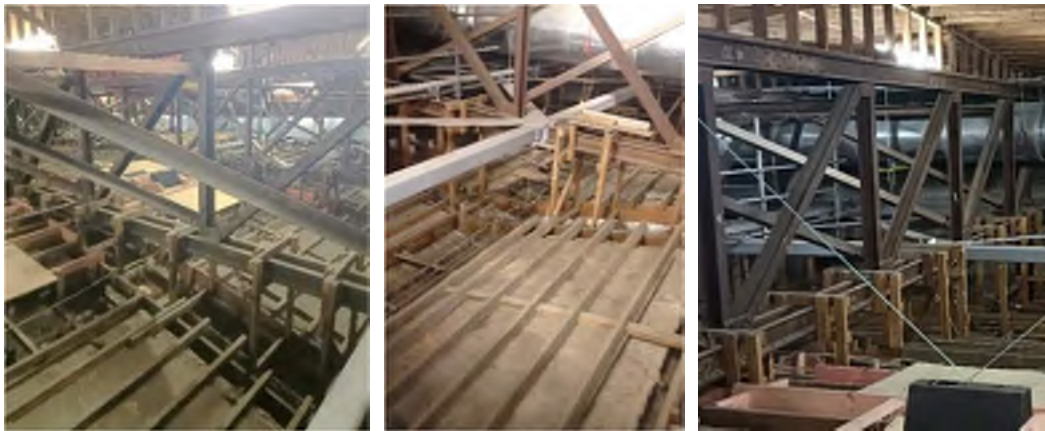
Photos of ceiling framing and hangers to steel trusses from inside roof space.
